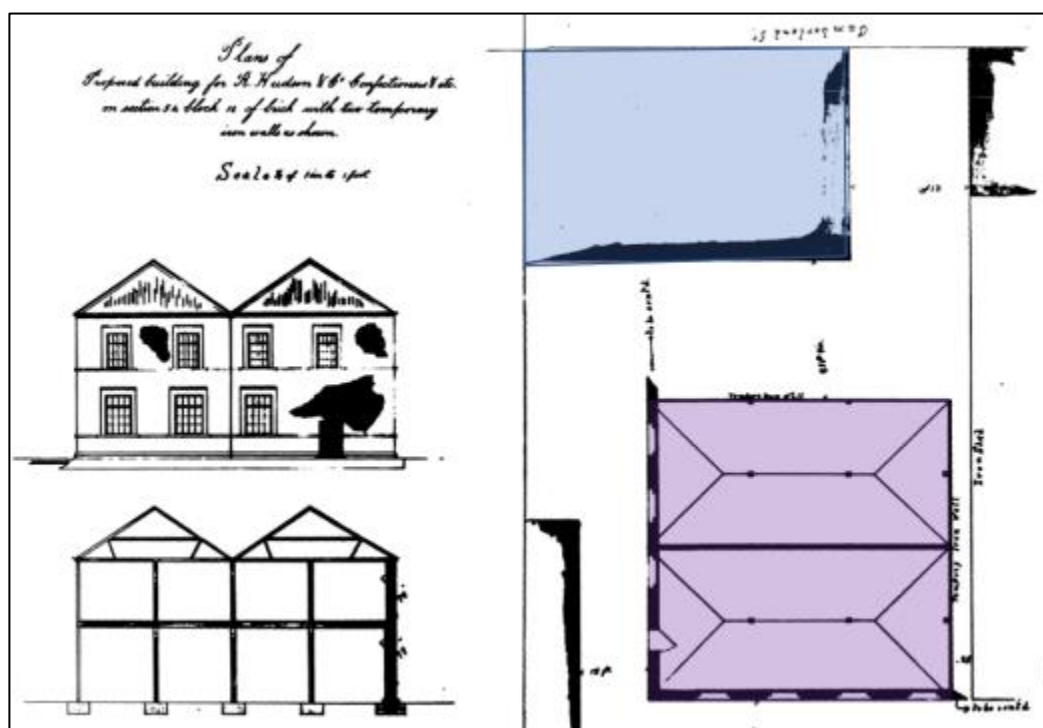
1909 plan showing the new building (Phase two) highlight purple that would be extended west to meet the northern extent of the granary/malt floor building highlighted blue. Note the temporary iron walls for further expansion (DCC Archive).
